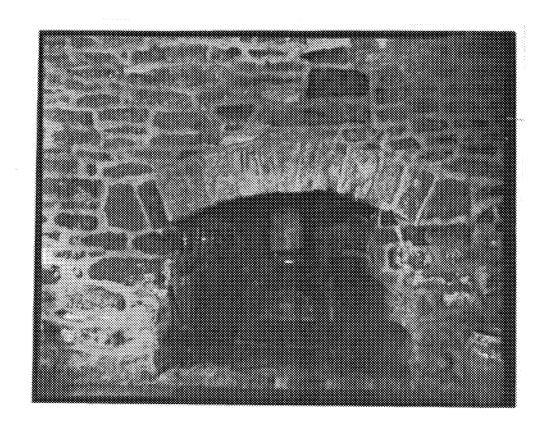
Darnall Farm, first floor: detail of fireplace looking east.
